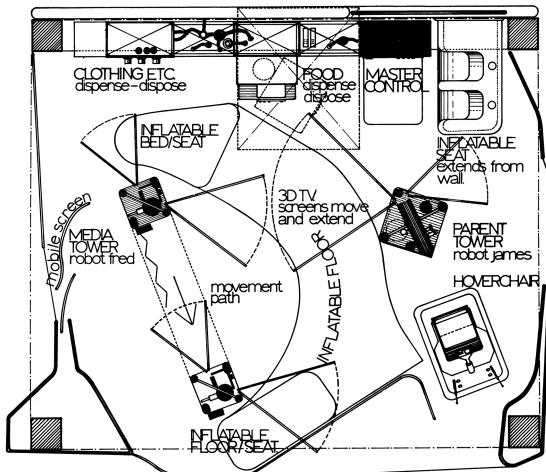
House 1990 – Living 1990, Floor plan for the exhibition installation in Harrods department store, Knightsbridge, London.
